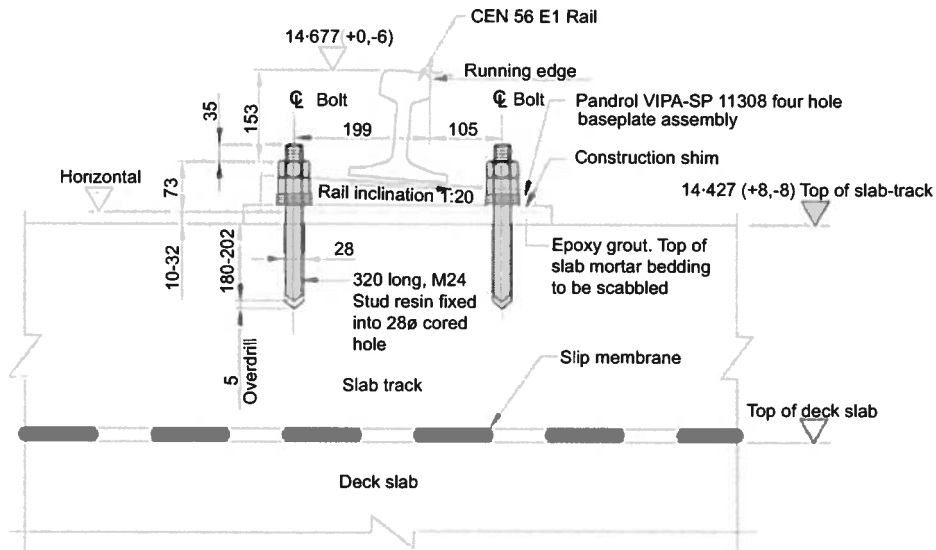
Slab-track base plate arrangement (dimensions in mm)
